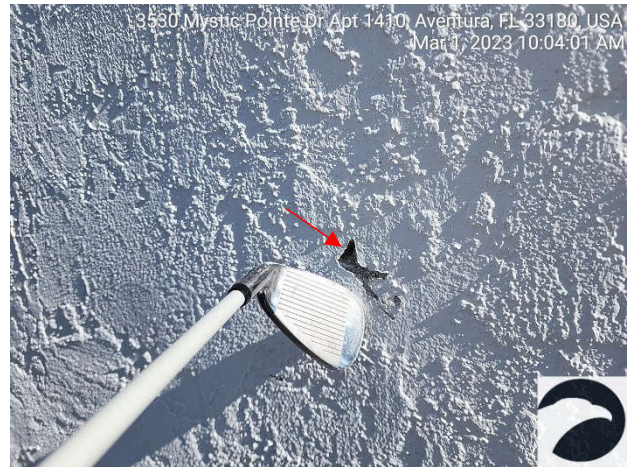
c.28 – Delaminated stucco, hollow sound at parapet wall (Roof Level)
